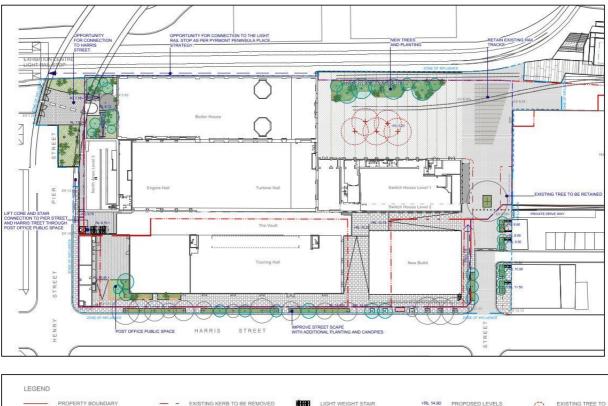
| Concept Landscaping Plan – Reference design (Source: Applicant's Urban Design Report)
